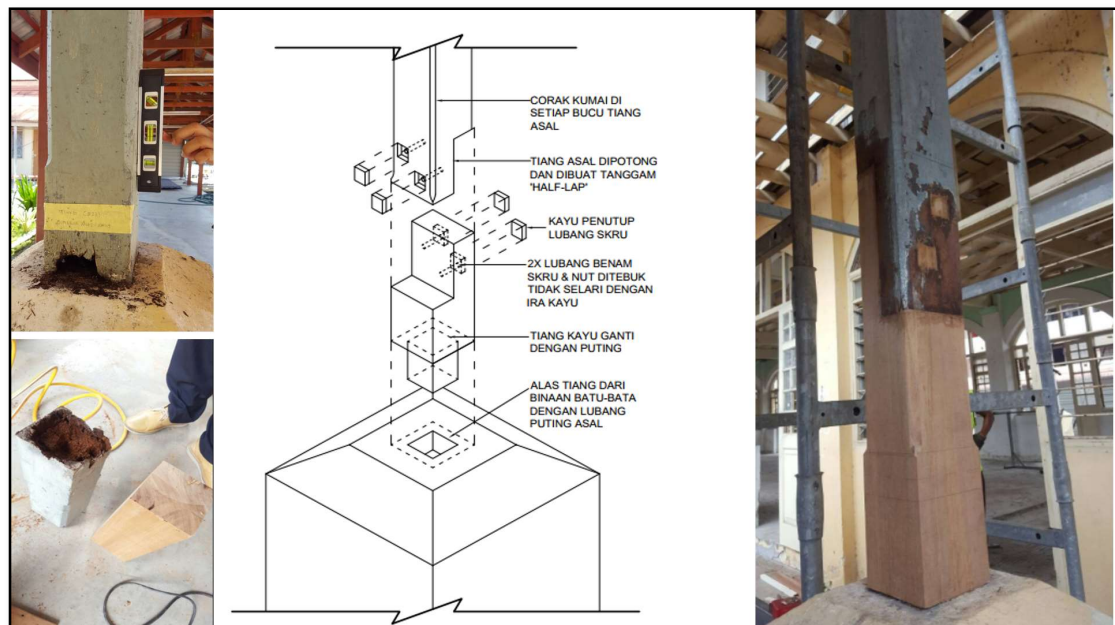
Timber pillar defect due to deterioration. Right; timber pillars have been fragile due to pest attack. Middle; Exploded view on ‘cut and joint’ method and left; Complete timber pillar restoration
